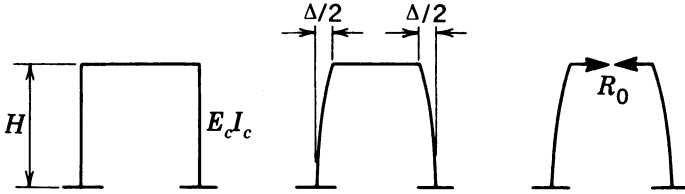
Effect of beam shortening in a frame composed of two cantilevered columns and a beam with hinged beam-to-column joints.
